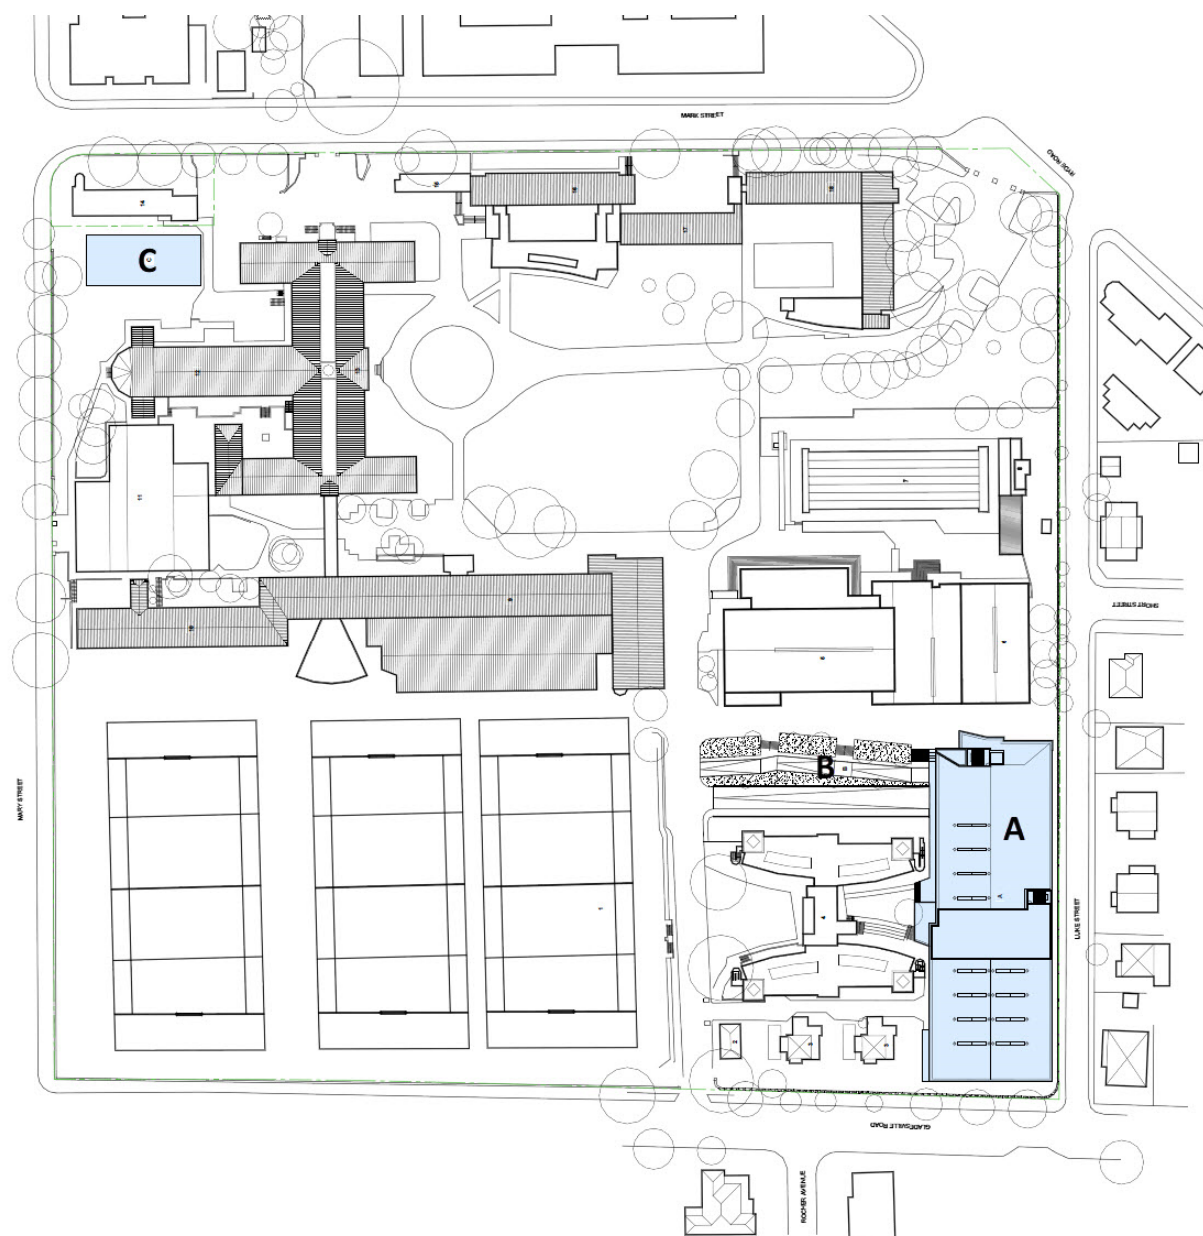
Demolition/existing site plan (Source: TKD Architects)
